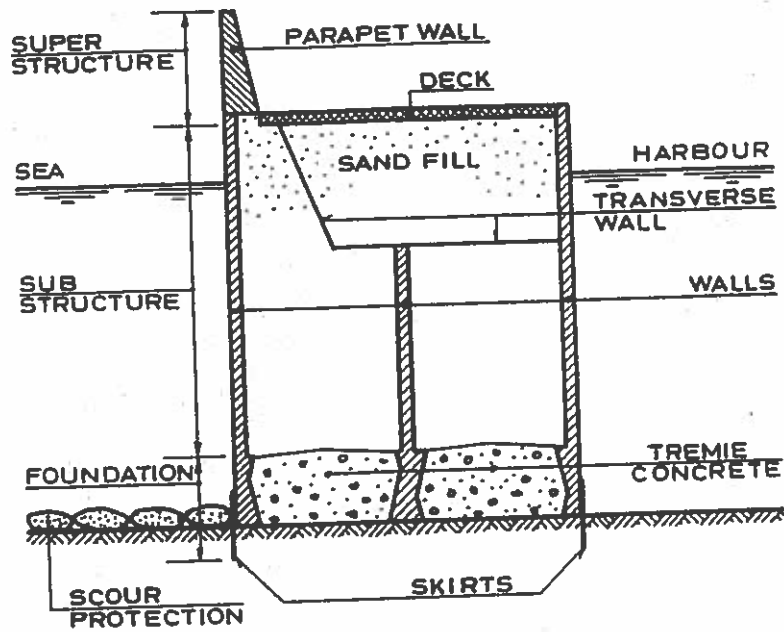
(a) Typical Caisson Breakwater Cross Section
